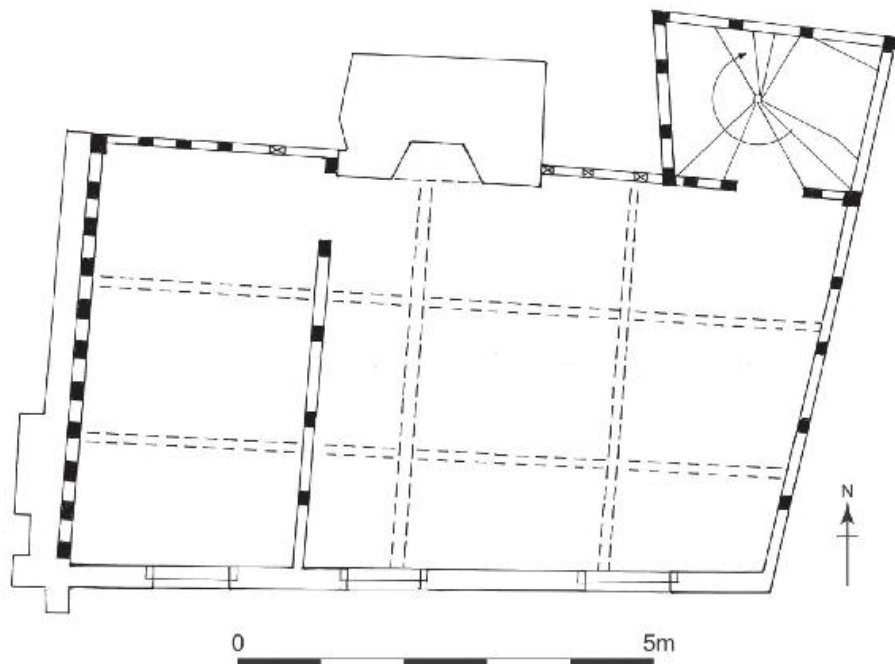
First-floor plan of the main portion of Wyebridge House, showing it divided into two unequal full-width rooms with an irregular stair turret at the north-eastern corner. Note how close the primary doorway through the cross-frame between the two rooms is to the fireplace
